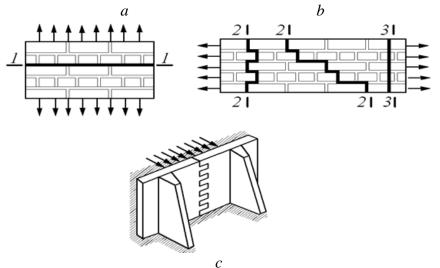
Destruction of masonry from tension: a - for unbounded section; b - for wall-bound section; c - during bending; 1-1, 2-2 - cross sections passing through the mortar; 3-3 - section that passes through the stone
